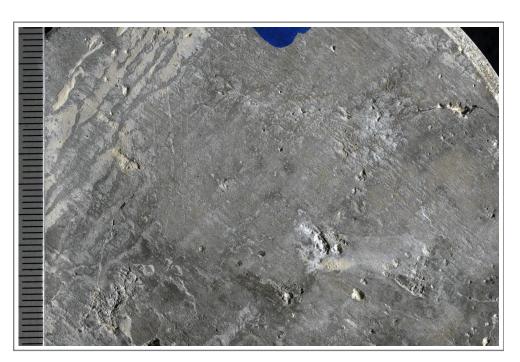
Photograph showing detail of the formed outer surface; scale in millimeters.
